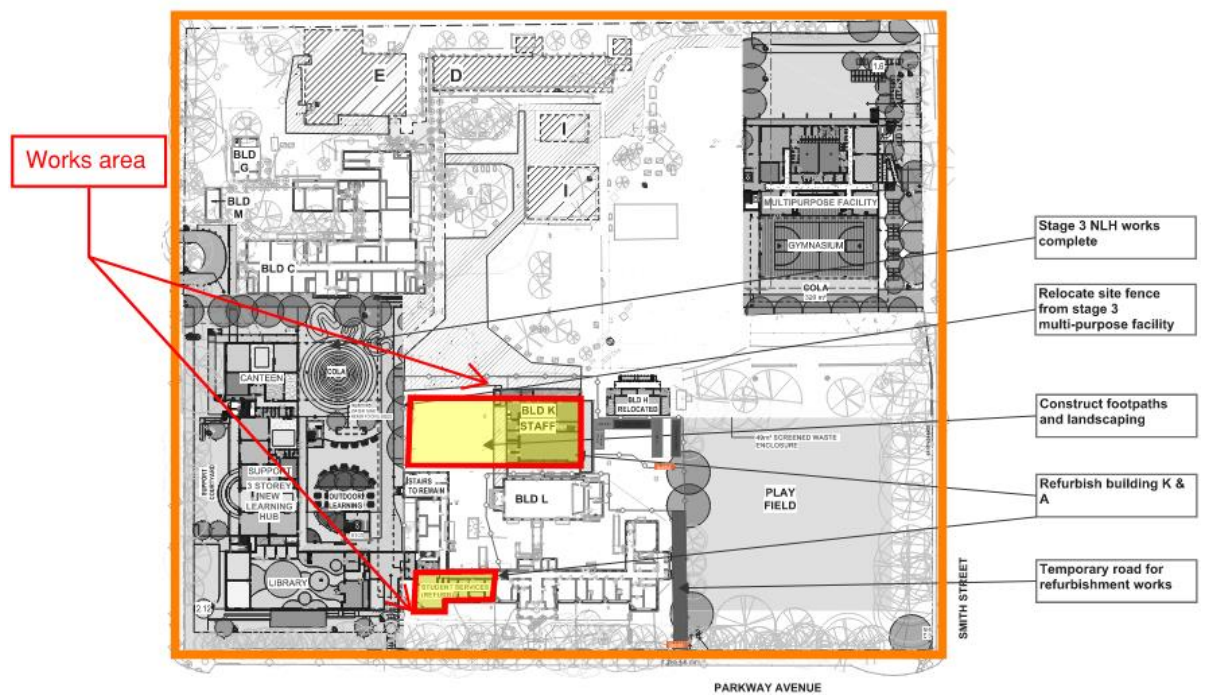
Stage 4 - Indicative site plan with site boundary plus works area highlighted.
